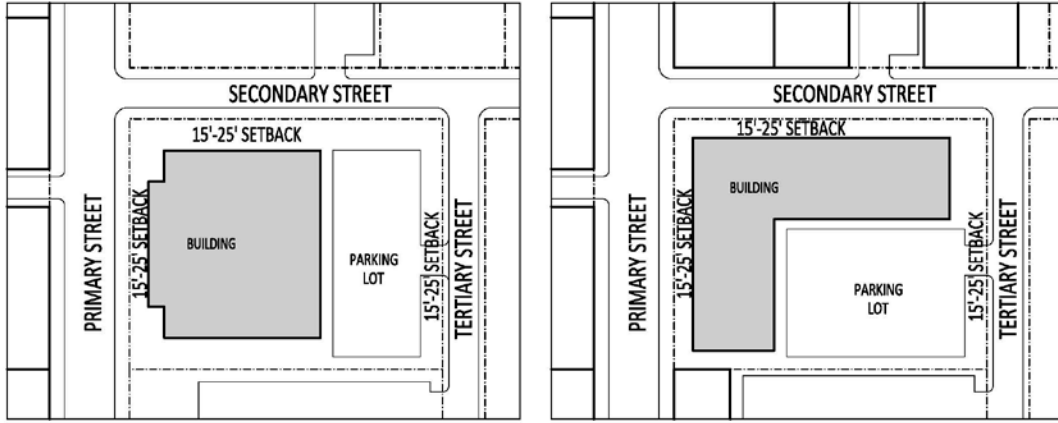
Setback Diagrams: Building located within 15'-25' of lot line for a minimum of 50% of Primary Street and Secondary Street frontages.
